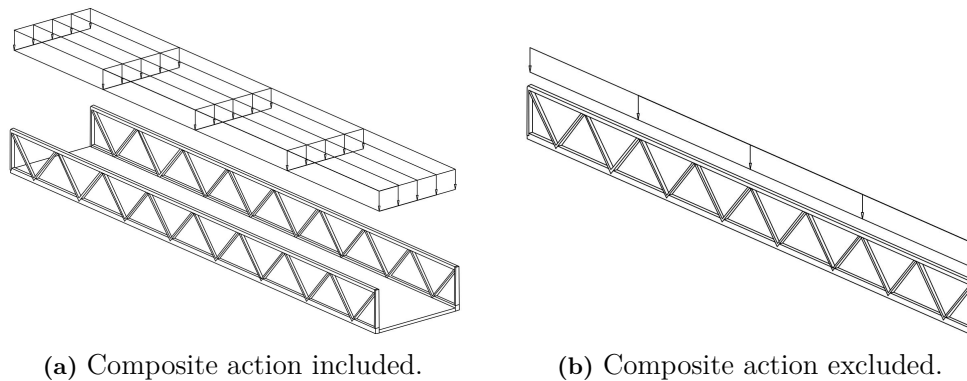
Models to examine the composite action between truss system and bridge deck.
